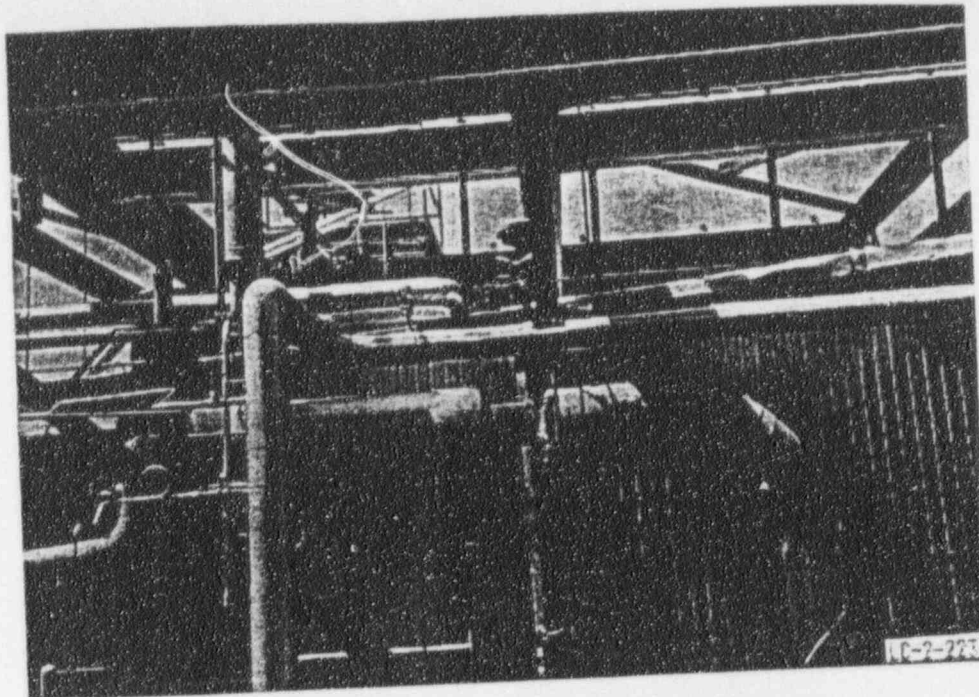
Typical piping and pipe support configurations at PALCO Co-generation Plant.
